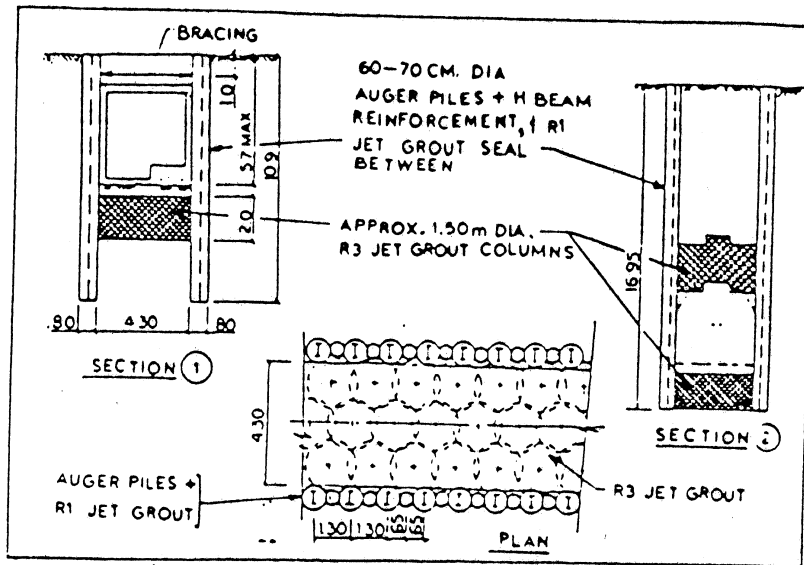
Jet Grouting Applications to Enable Cut and Cover (Section 1) and Tunnelled Excavation (Section 2) for New Sewer Construction, Torre Annunziata, Napoli, Italy.
